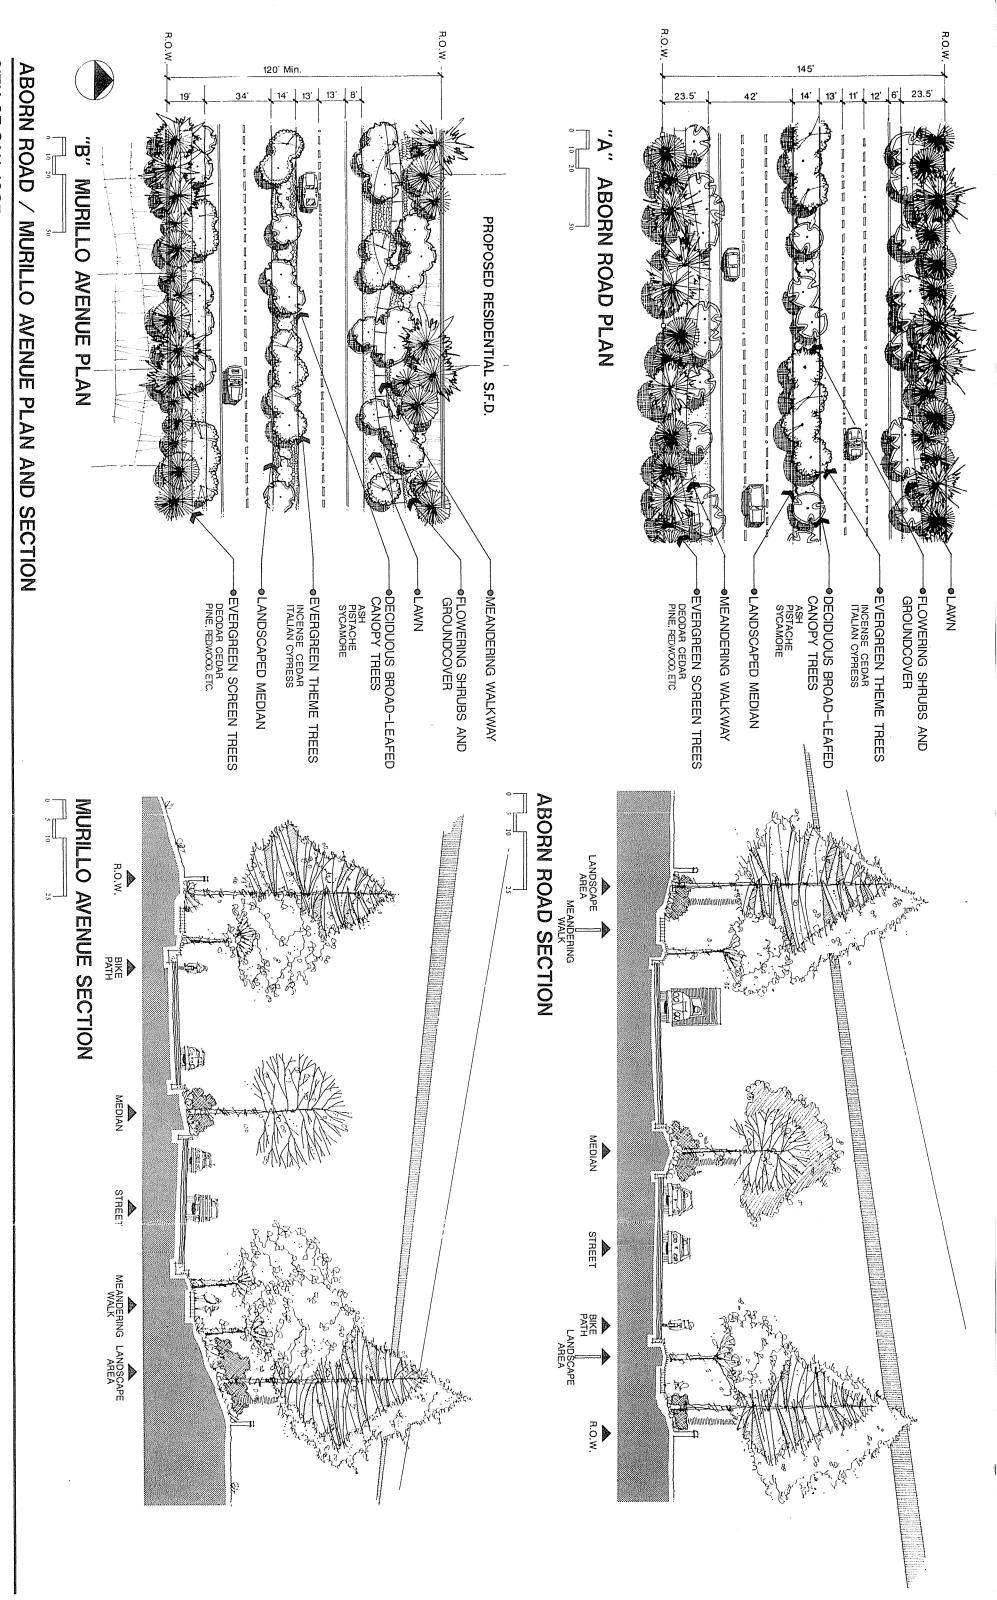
provides plan and section views of Aborn Road and Murillo/Yerba Buena Avenue.
